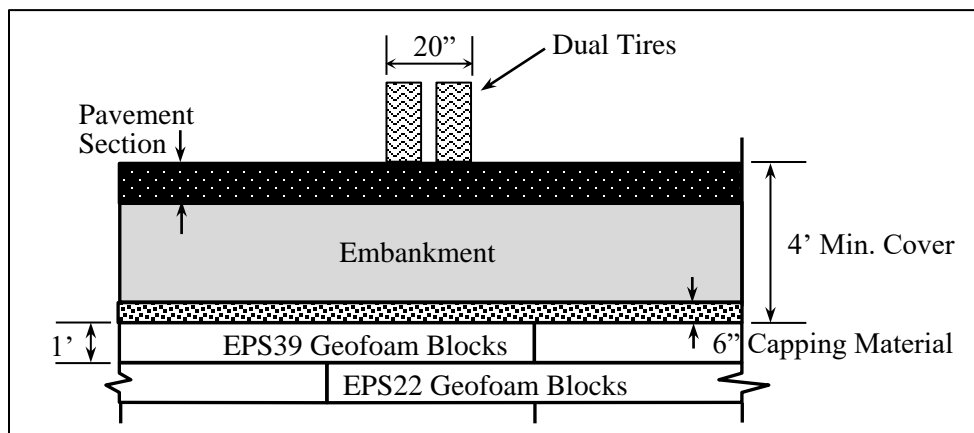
Typical Geofoam Embankment with 4 feet of Cover
